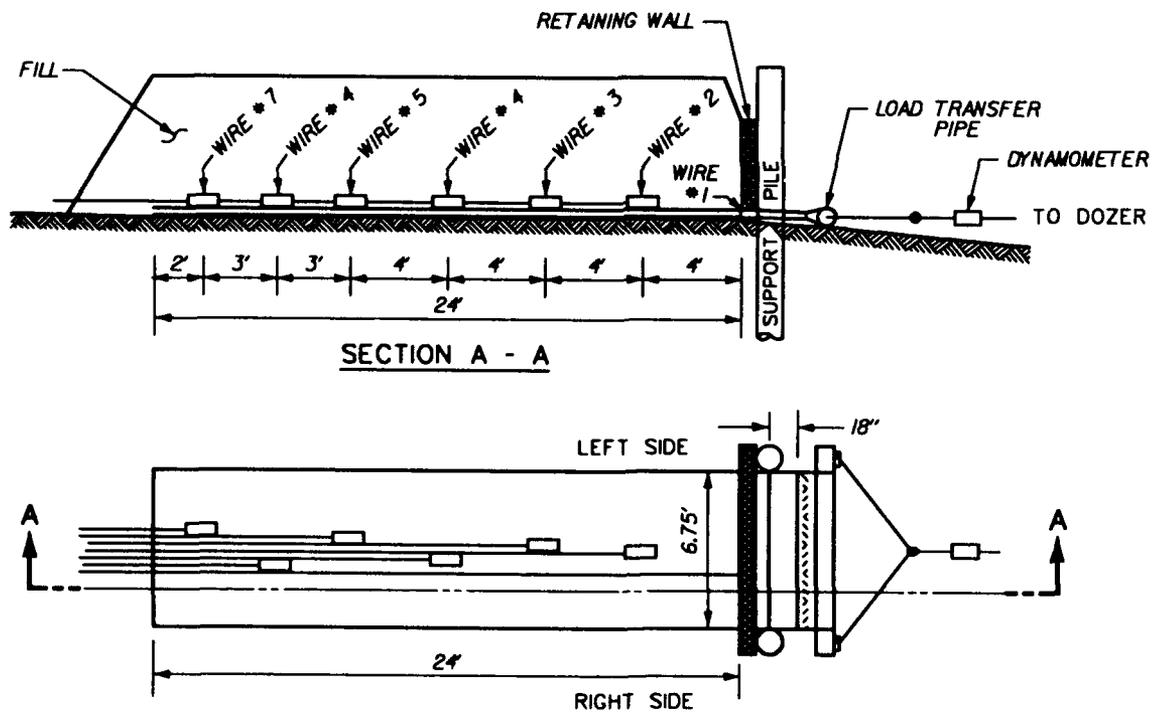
Schematic of test configuration at Bonne Carre Spillway
